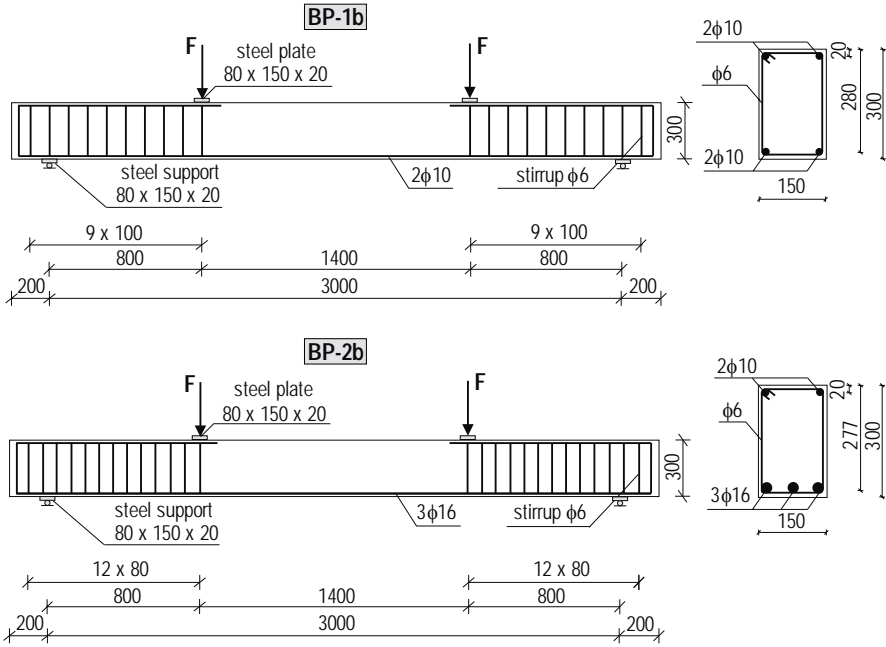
Dimensions and cross-section of BP beams with reinforcement and loading arrangements
